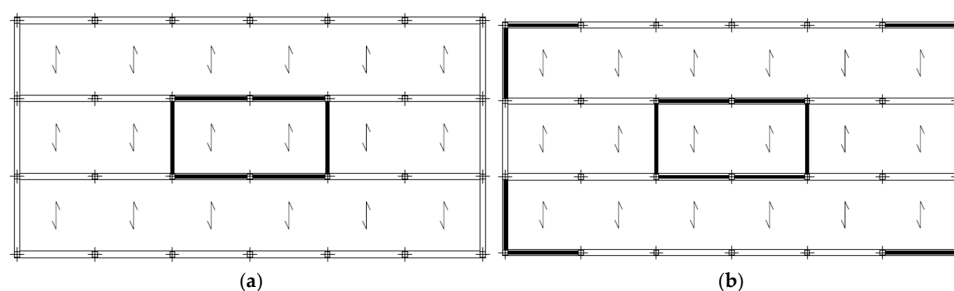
Locations of the infill walls (shaded in black colour) within the building structures considered; (a) “–Walls”; (b) “+Walls”.
